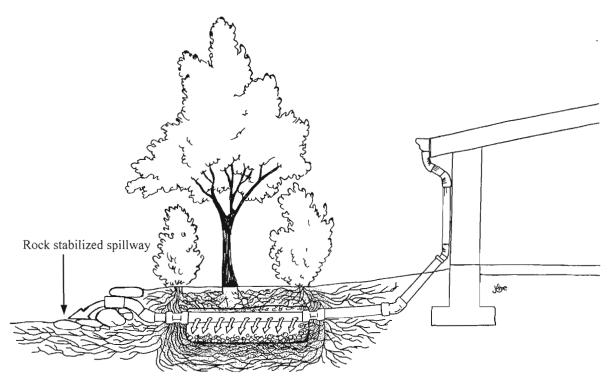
French drain with pipe connected to downspout. Note the overflow (exiting a dry-laid retaining wall) is higher than the perforated pipe in the French drain, so most of the water infiltrates into the drain, while the overflow is lower than the inflow elevation where the downspout enters the pipe, so no water backs up against the house. A rock apron diffuses the falling overflow water. Note: While the illustration's perspective may be misleading, the vegetation is planted adjacent to the French drain, not on top of it.
